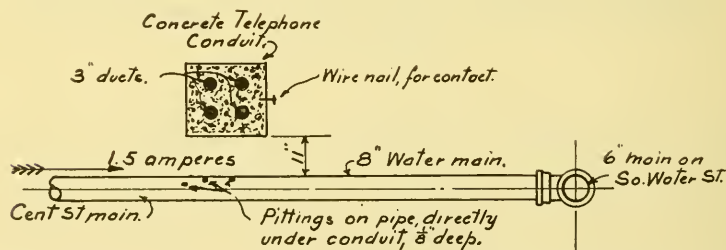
EXCAVATION AT SOUTH WATER AND CENTRE STREETS, PROVIDENCE, R. I., NOV. 23, 1908, SHOWING CONDITION AS TO CONDUIT AND MAIN.
